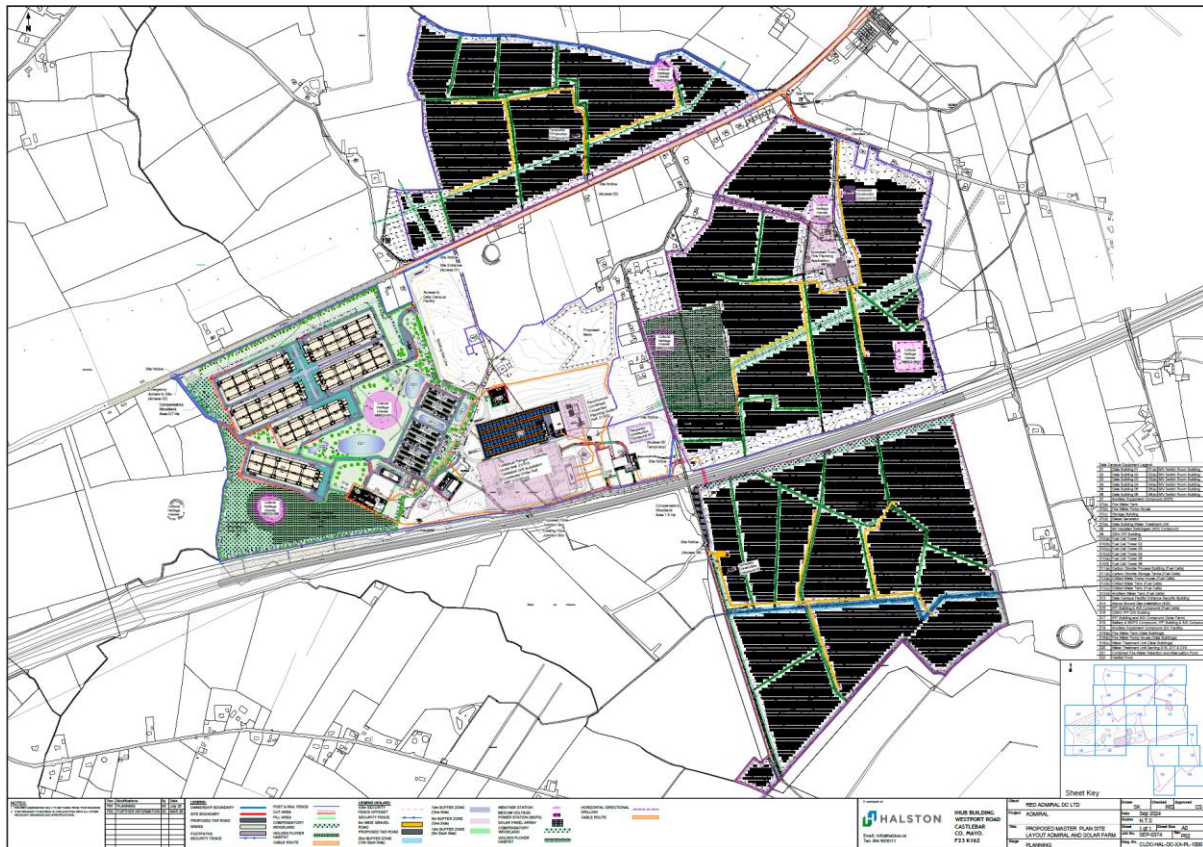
Landscape and Biodiversity Mitigation Plan
